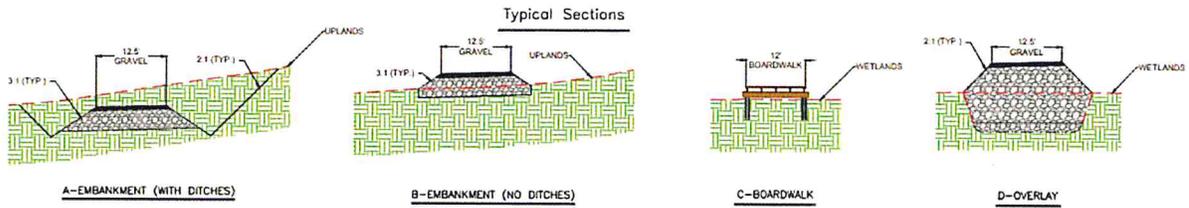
Cross-sectional vertical build for from Plans in Hand
